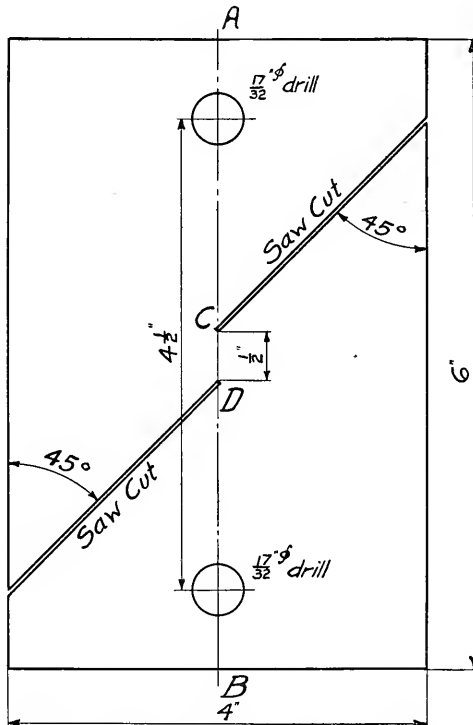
FORM OF SHEAR SPECIMEN CUT FROM WEB OF GIRDER
